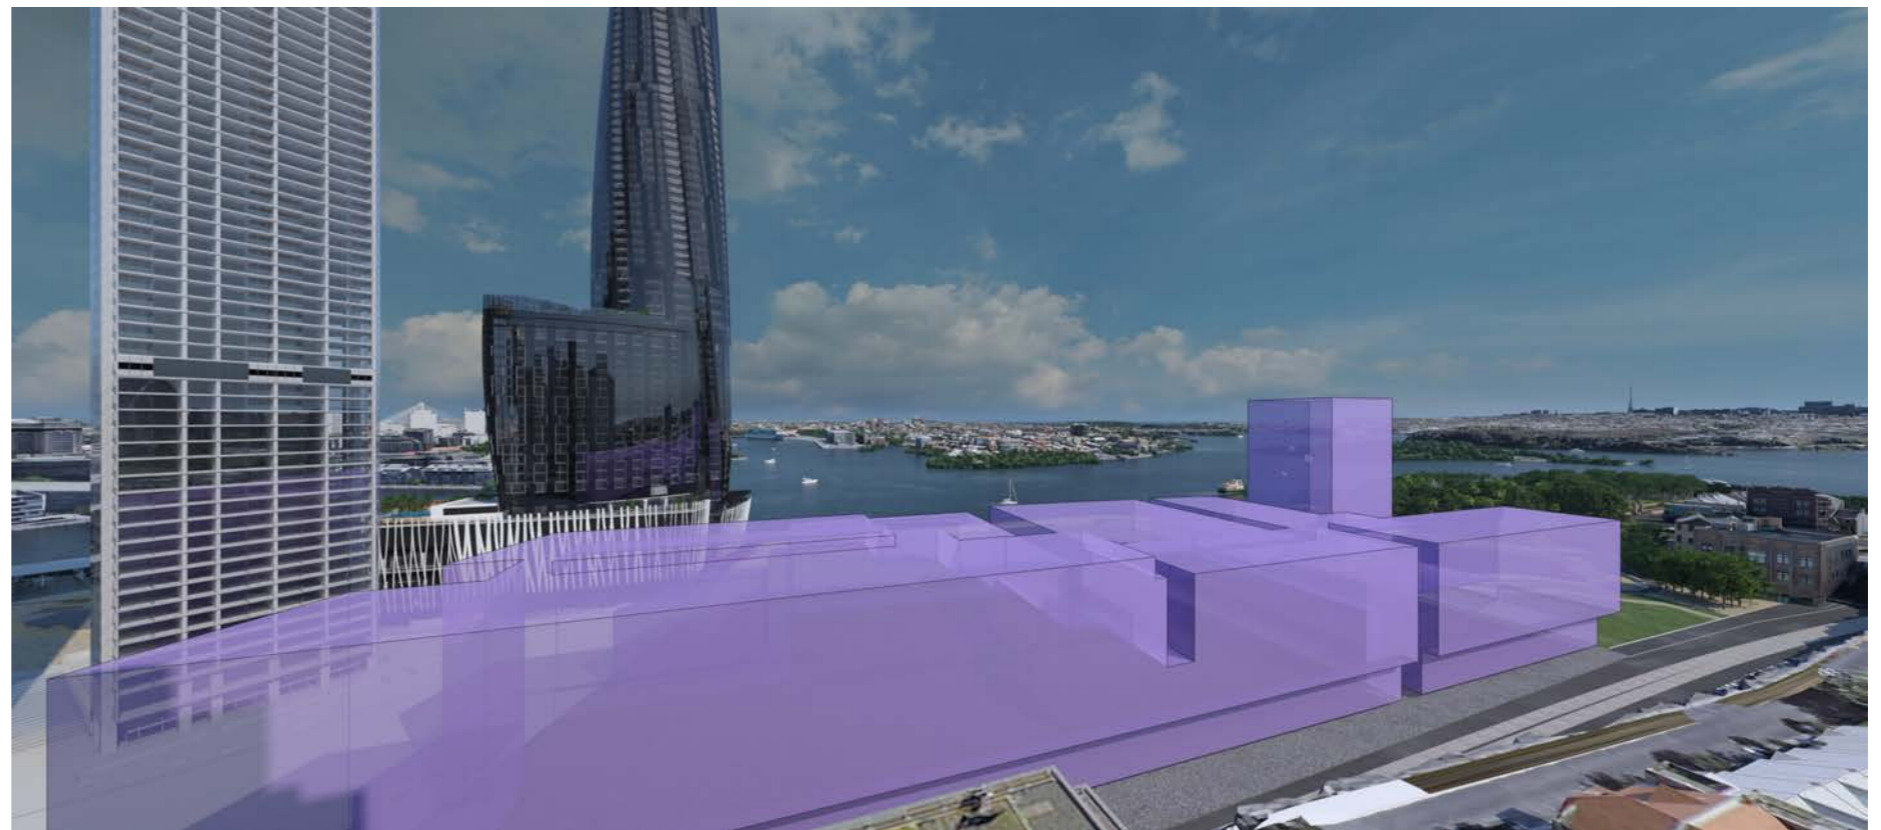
Elevation Looking East - MOD 9 with the Approved Concept Plan shown in light blue outline (Source: Modified from HASSELL diagrams (October 2020))
